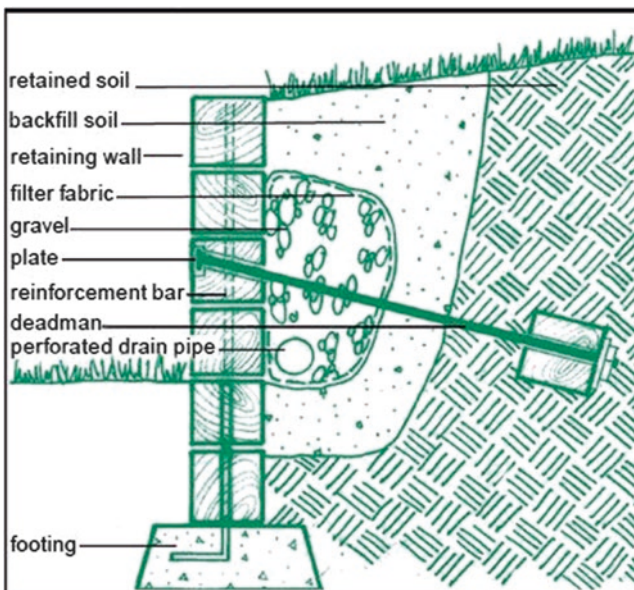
Crib wall. (Source: https://web.mst.edu/~rogersda/umrcourses/ge441/online_lectures/retention_structures/GE441-Lecture6-2.pdf)
